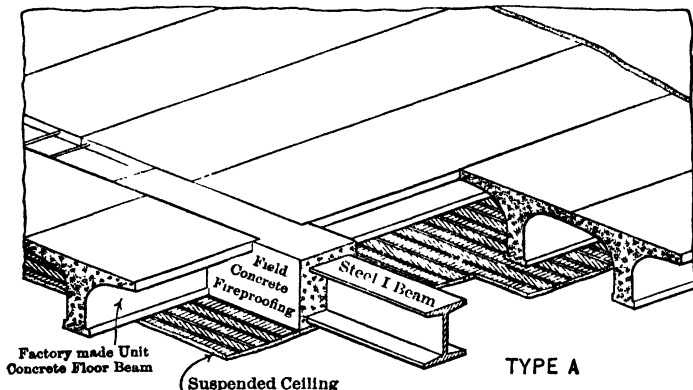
Watson Reinforced-Concrete Floor-Construction. Without Slabs
